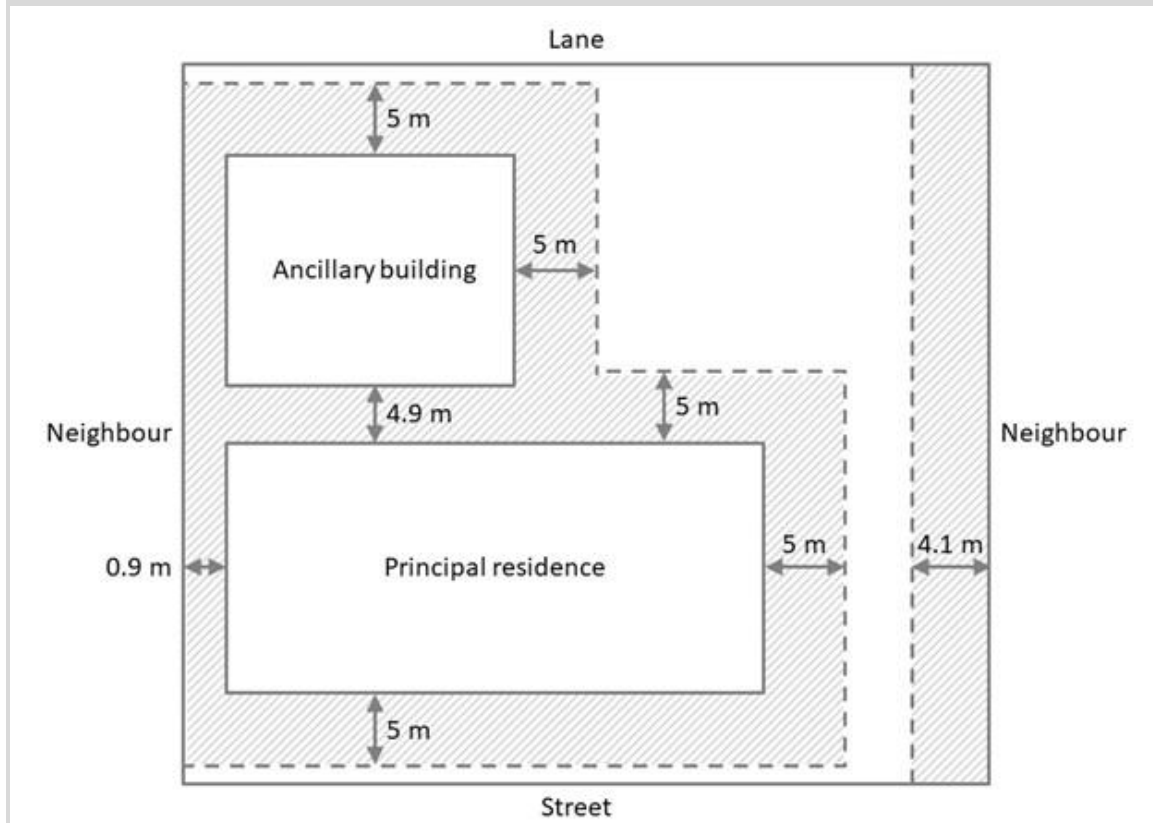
(2) Minimum setbacks for on-site infiltration systems from buildings and neighbouring properties. Not to scale.
